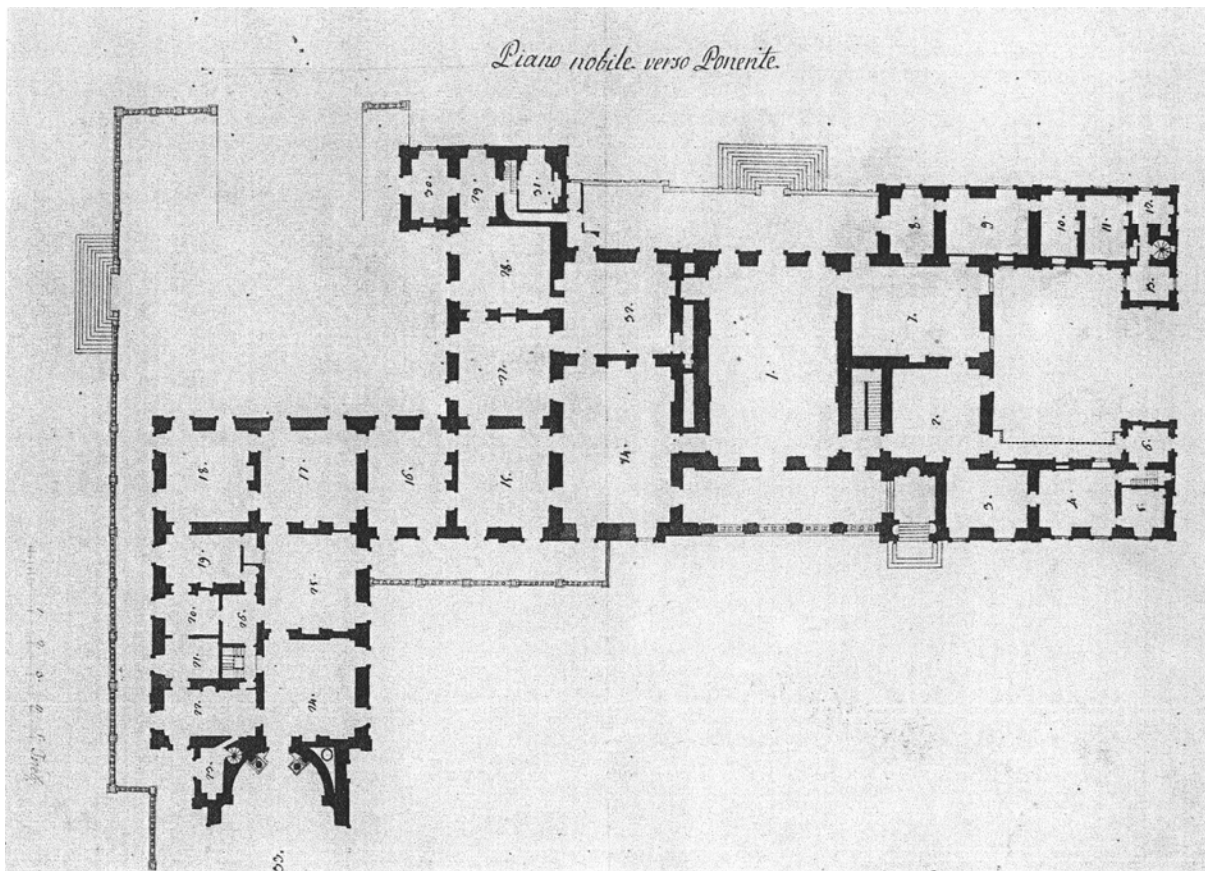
Benedetto Alfieri? Plan of Venaria Reale
